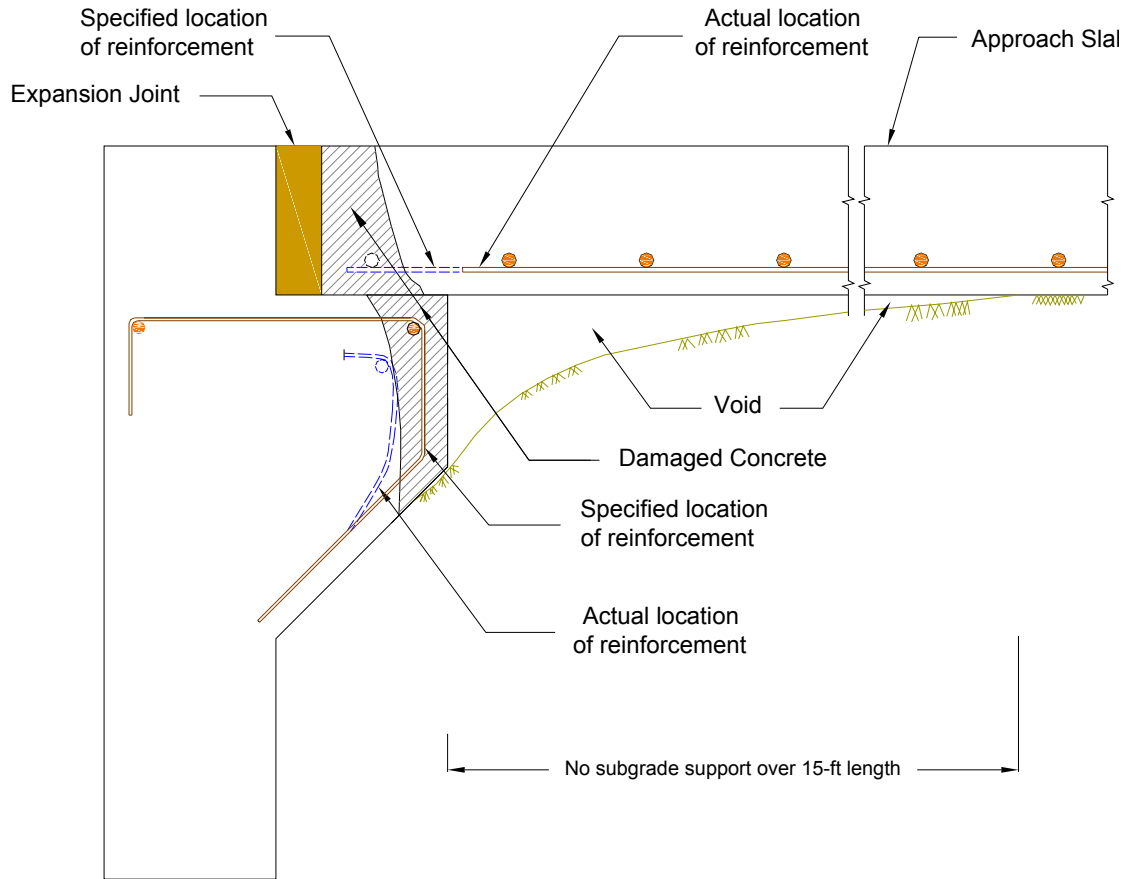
Inaccurate placement of reinforcing steel in the paving notch and the approach slab (Brakke 2003)
